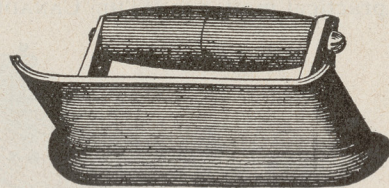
TOOL USED IN ROUNDING EDGES.
